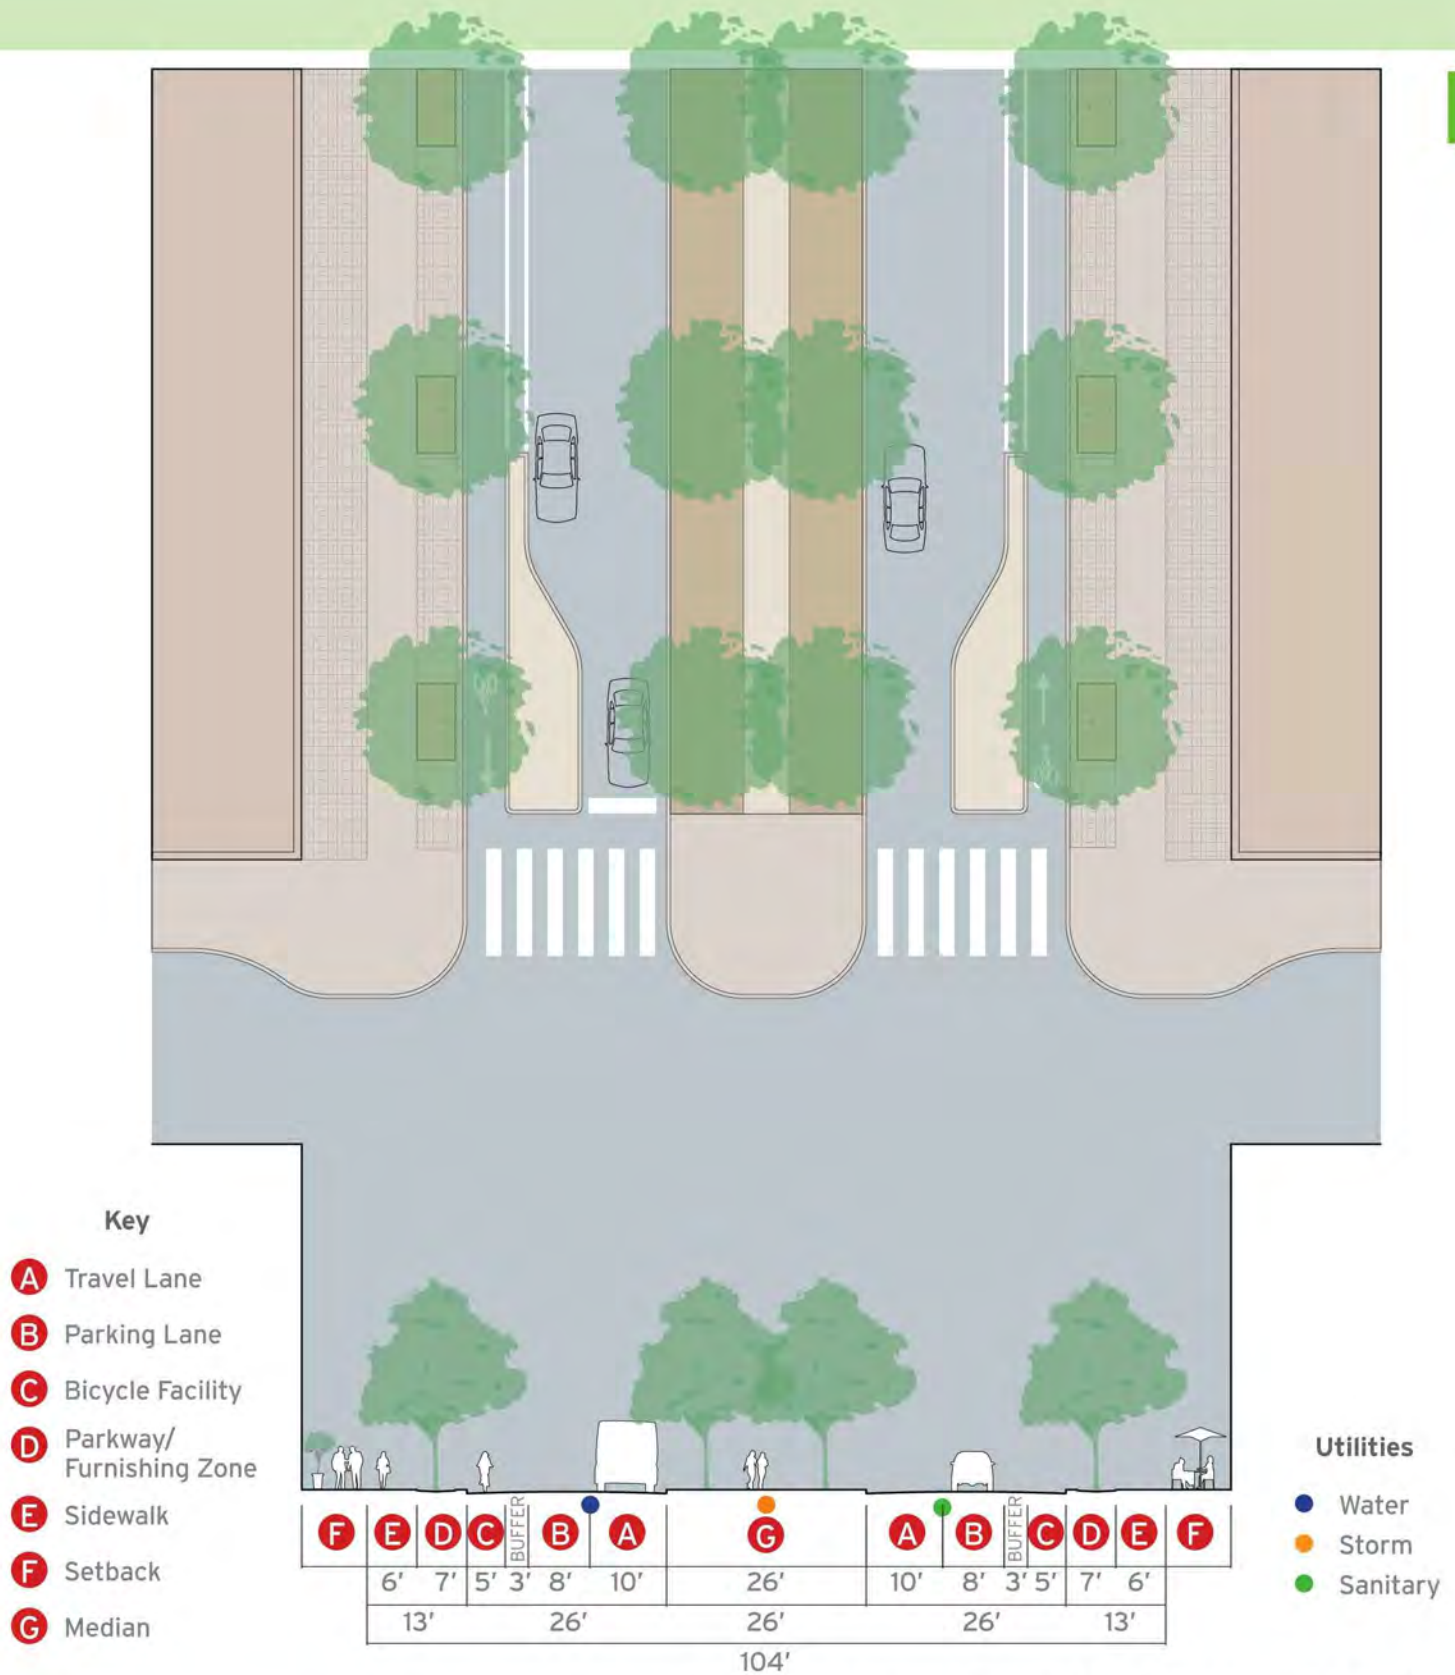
Greenway Boulevard Illustrative Plan and Section
